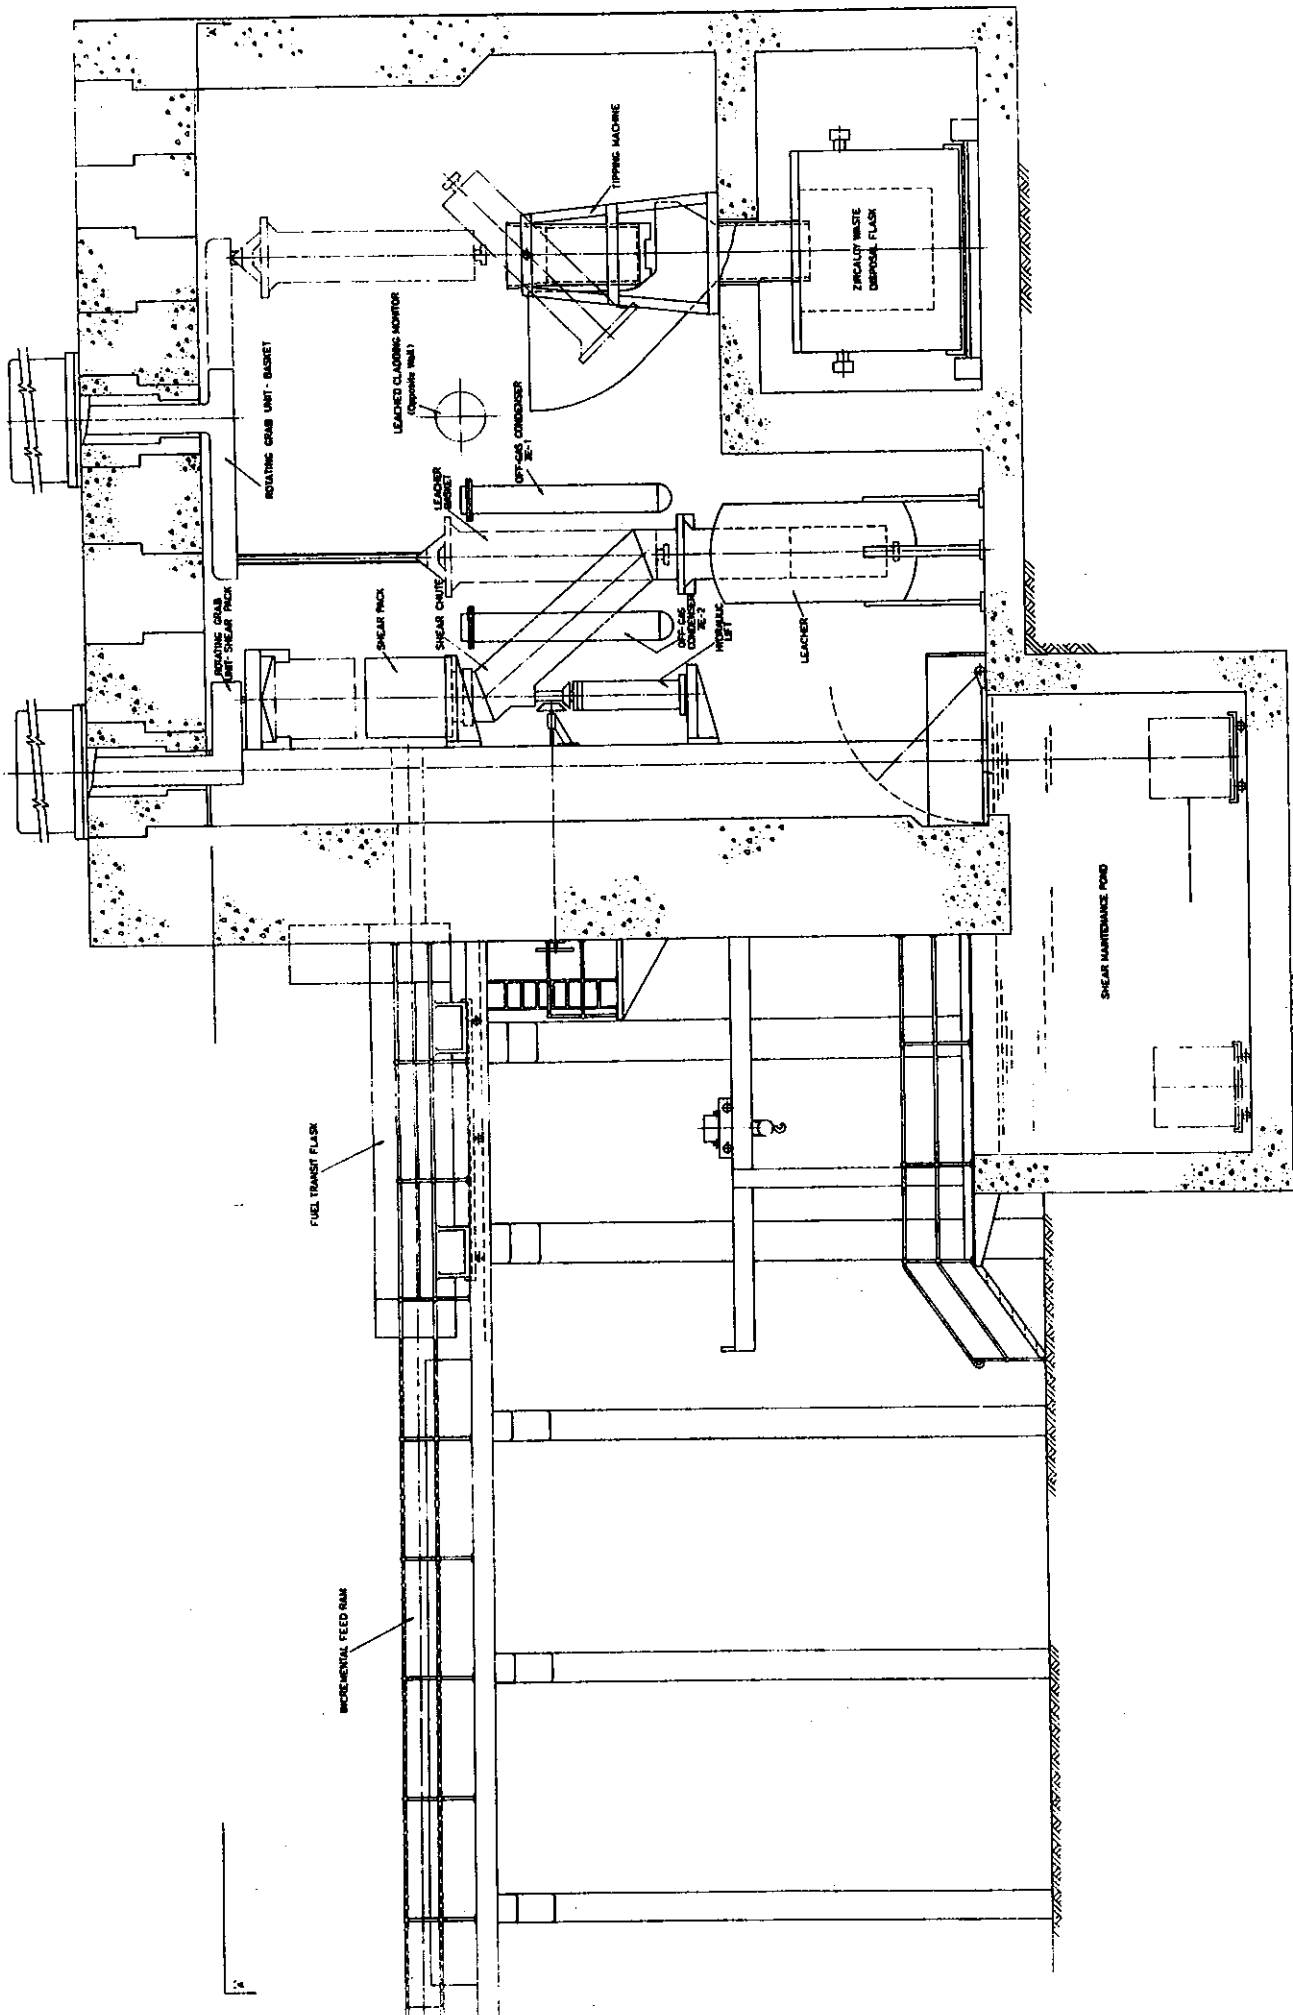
EQUIPMENT LAYOUT - SHEAR-LEACH CELL PLAN A-A
